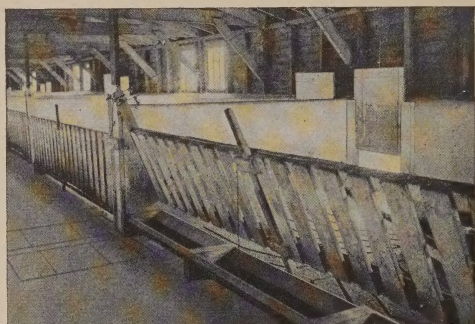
Above: Concrete hog-house pen with concrete feeding troughs.
